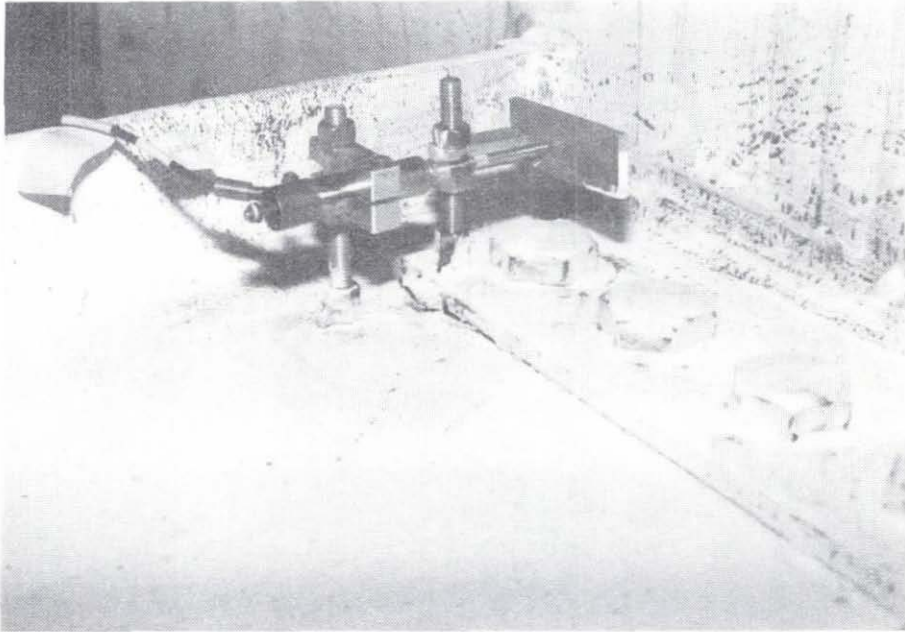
Fracture of Web Weld (Specimen 5)
